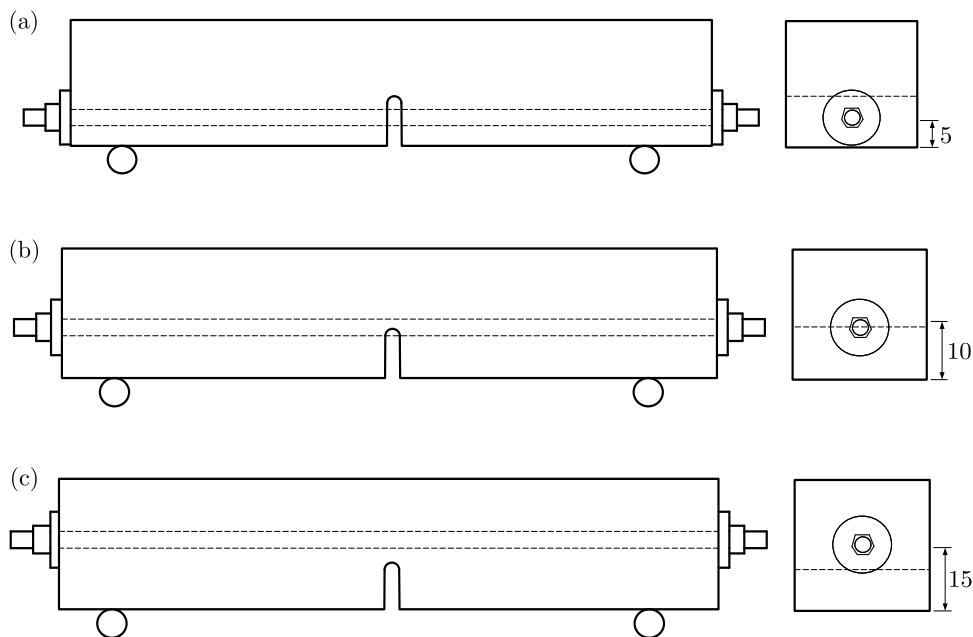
Anchor position [mm]: (a) through crack arrangement, (b) crack tip arrangement, (c) advanced crack arrangement
